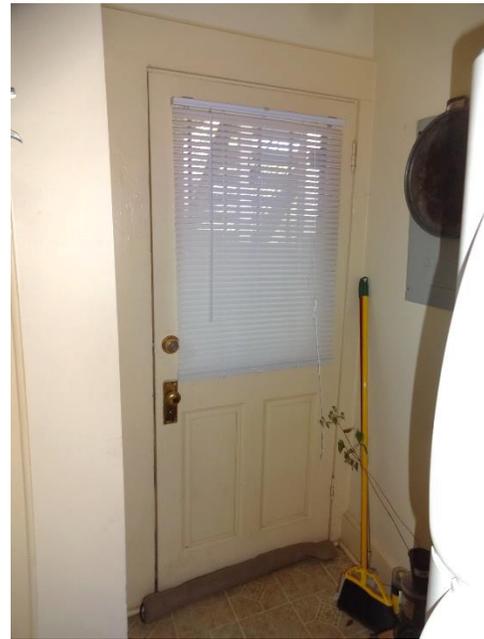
The interior face and trim of the north elevation door. Note two vertical panels at bottom half of door is typical.
